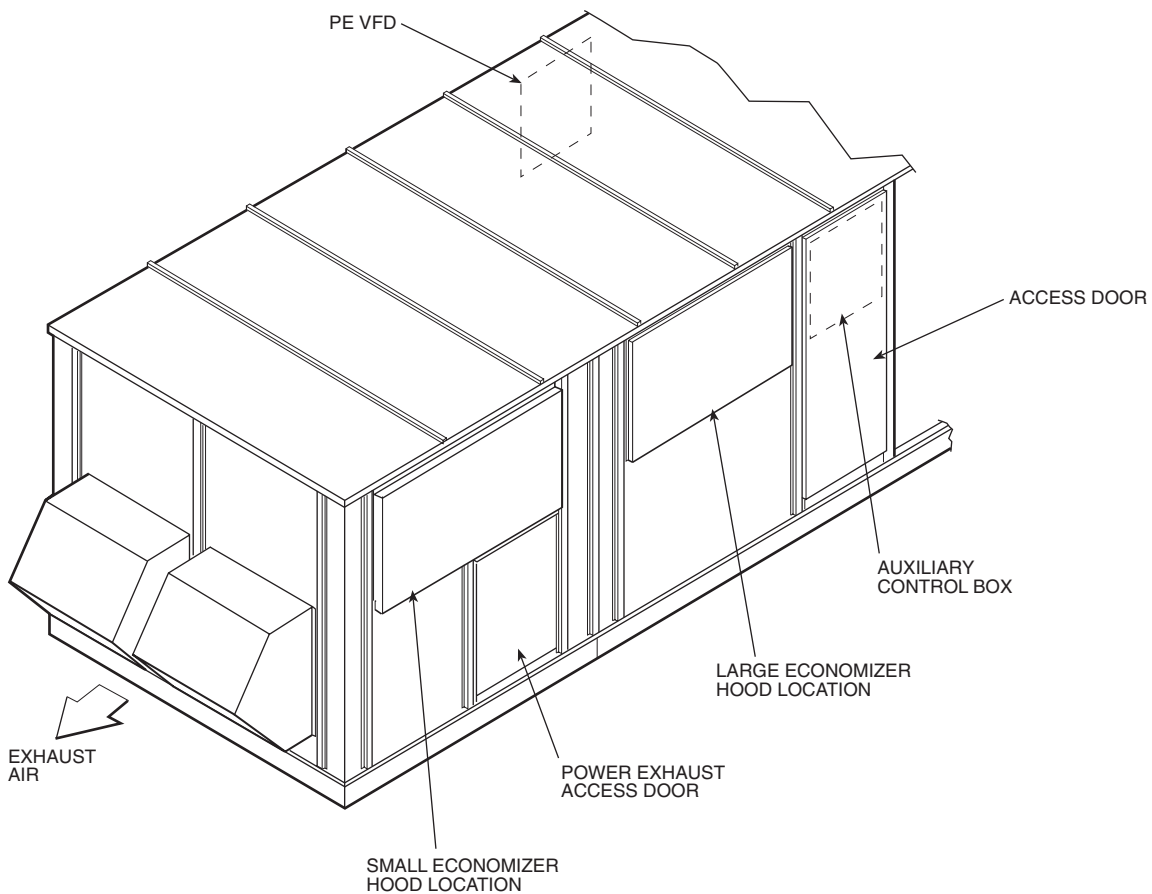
Modulating Power Exhaust Component Locations; Sizes 055-105 (48ZE, 50ZE Shown)
